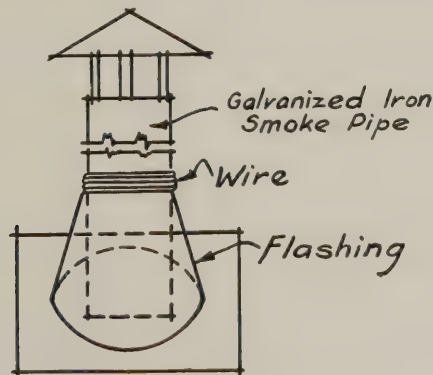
Primary type of ridge ventilation added in 1917, following recommendation by the Surgeon General
